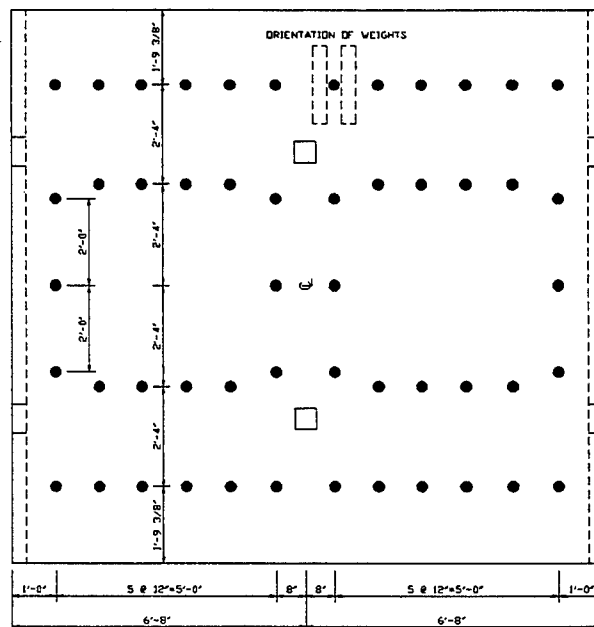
Lead Weight Locations, Third Floor (Roof) Slab
